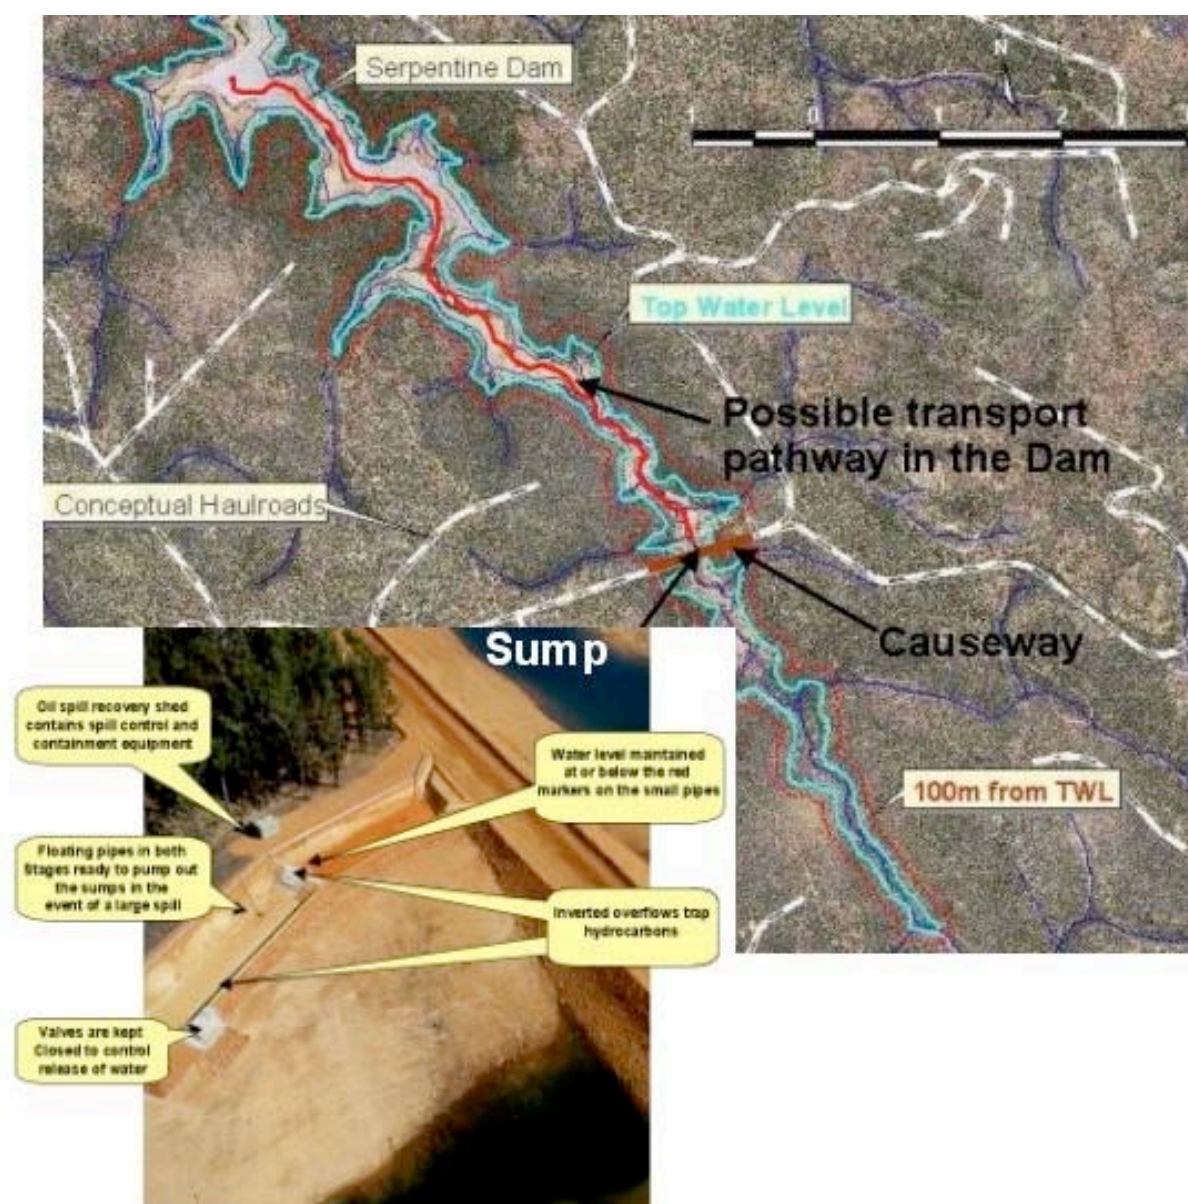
Schematic conceptual model of the Option 1 crossing showing the proposed causeway location, the sumps that Alcoa will construct, and the pathway by which any contaminants will be transported to the dam wall.
